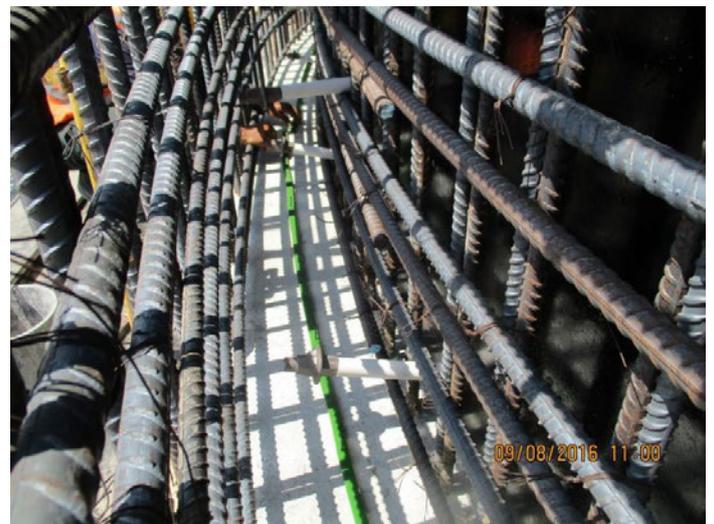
(Casting Concrete for Electrical & Control Building Ditches)
